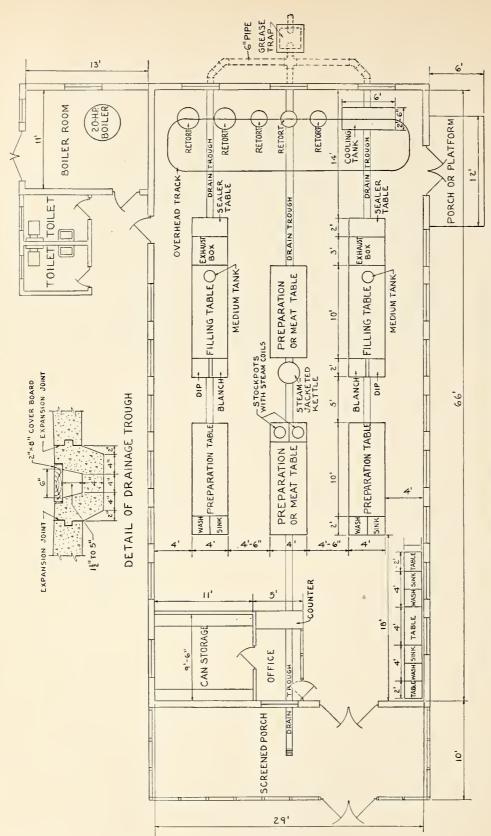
Floor plan of community canning plant with daily capacity of 2,000 to 3,000 No. 3 cans.
